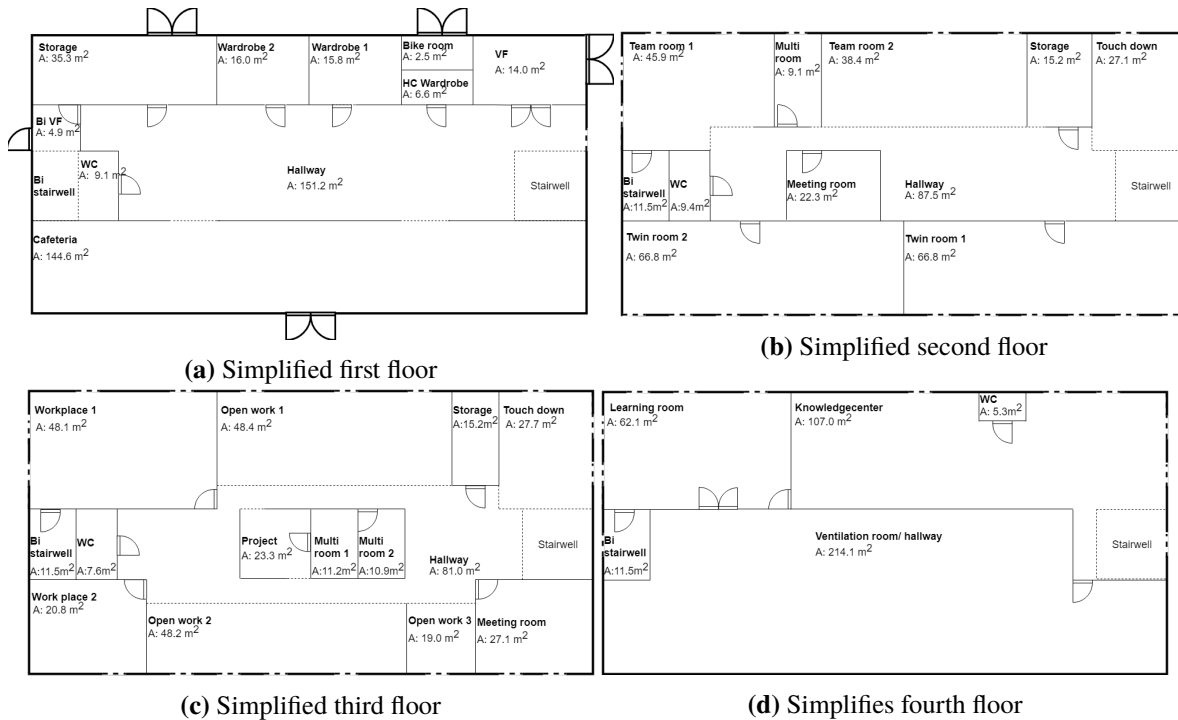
The floor plans of the building model of ZEB Laboratory implemented in the building model.
